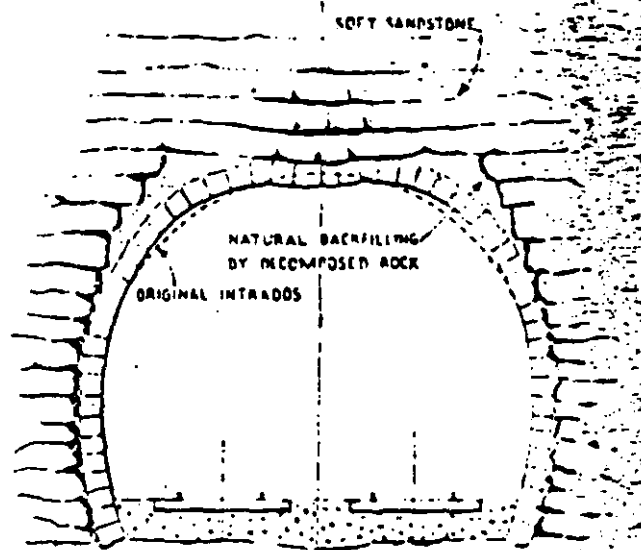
Deformation of a malconstructed tunnel arch by loosening pressure
